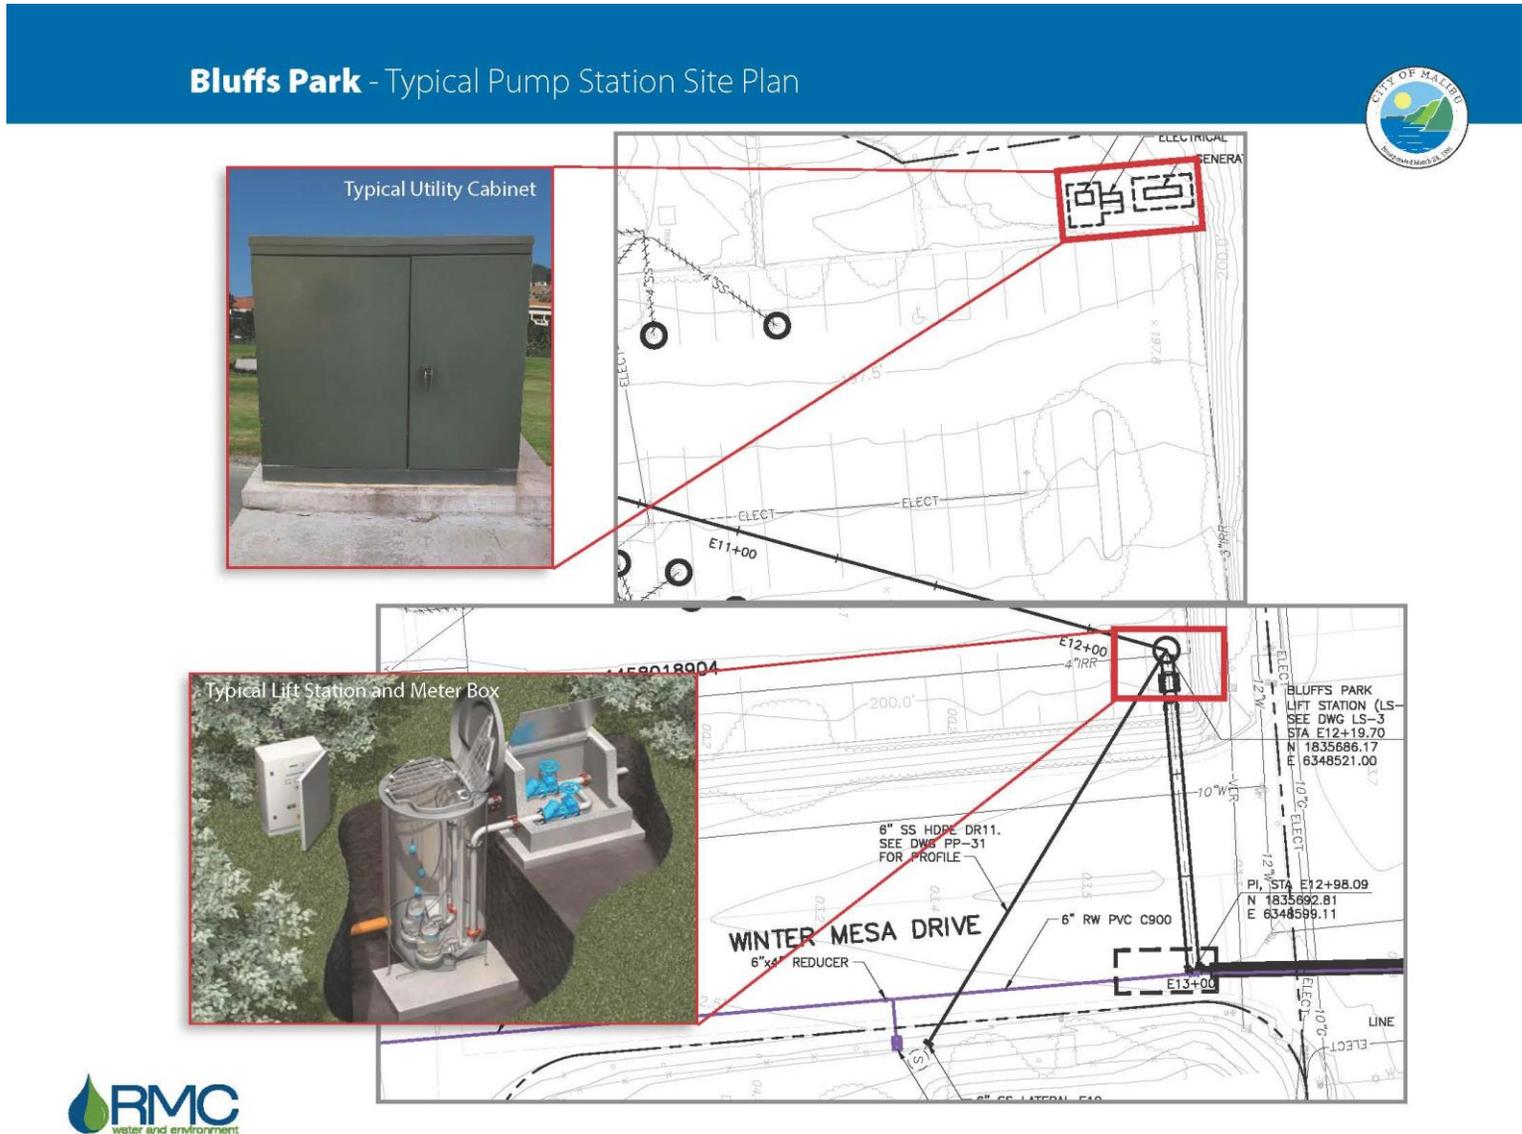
Typical Pump Station Site Plan – Bluffs Park
